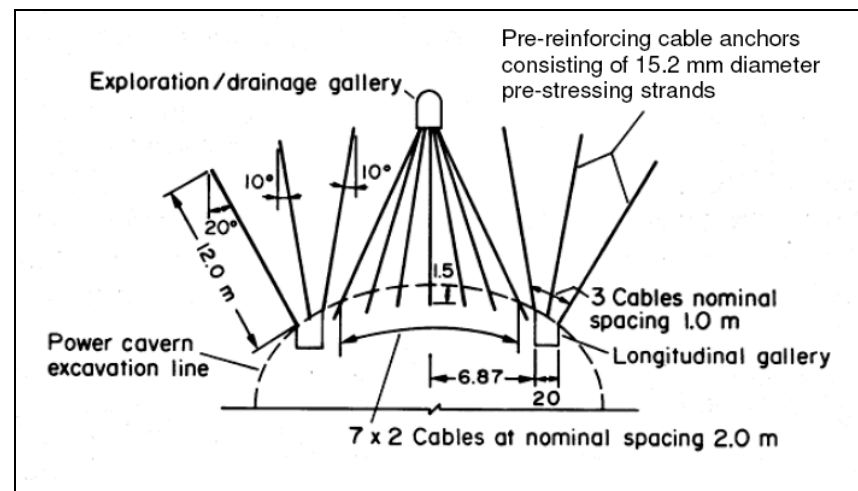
Pre-reinforcement of the roof of the powerhouse cavern in Mingtan (span = 22 m).
